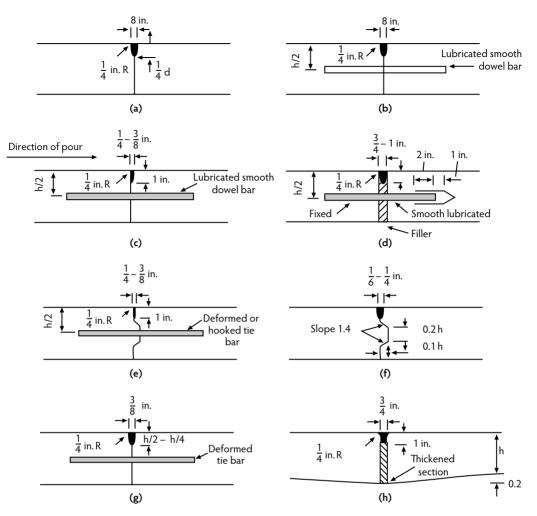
Various types of pavement joints. (From ACI Committee 224, *Joints in Concrete Construction*, ACI 224.3R-95, American Concrete Institute, Farmington Hills, MI, 1995, pp. 1–44.)
